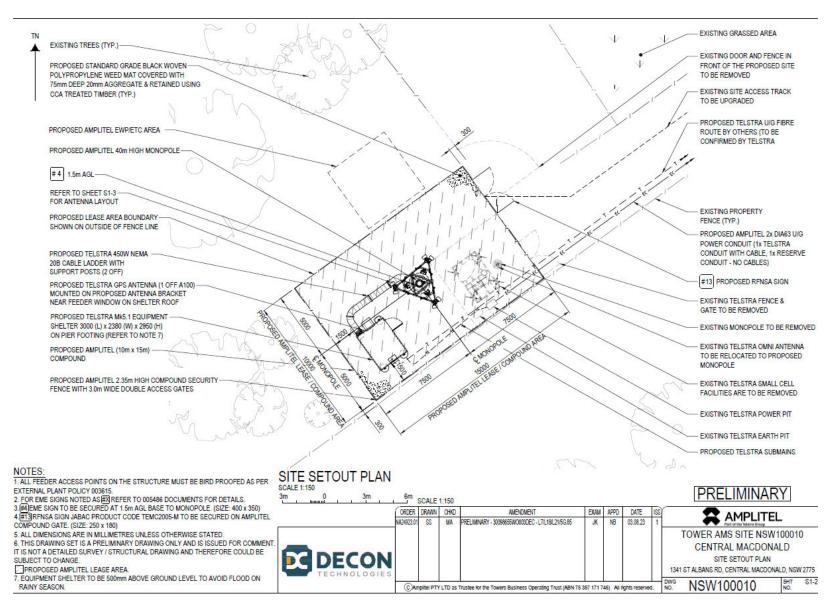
Site Setout Plan (source: DWG No. NSW100010 Issue 1 dd 03/08/23, Sheet S1-2)
